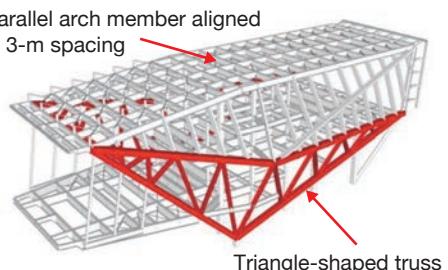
Image of Cultural Building Serving also as Office Tower Entrance
